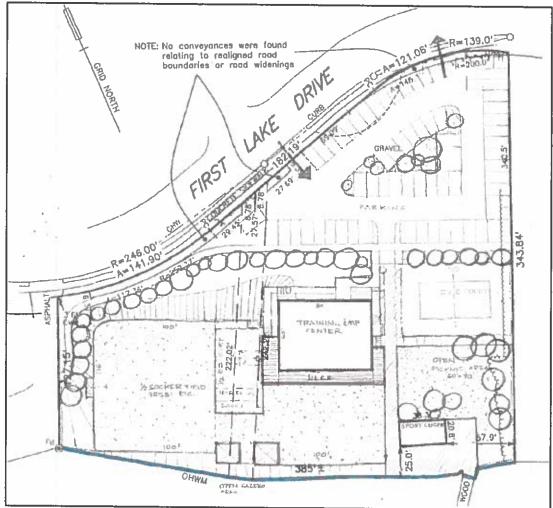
Site Plan for 159 First Lake Drive: Sackawa Canoe Club
